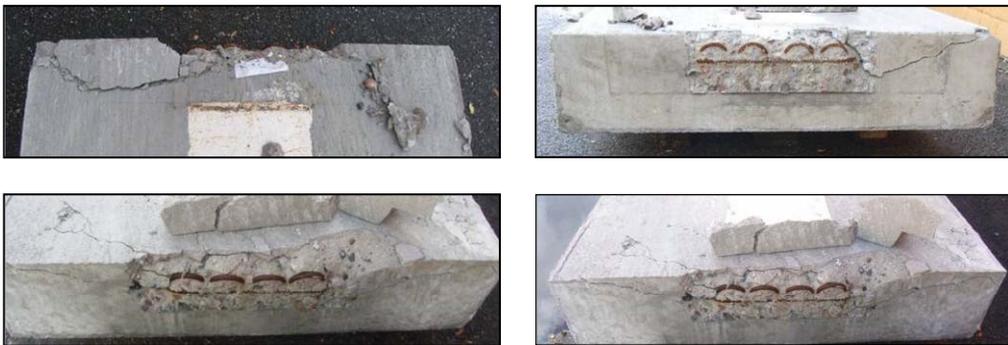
Photos of shear key type 1 after failure in the concrete covering layer.
